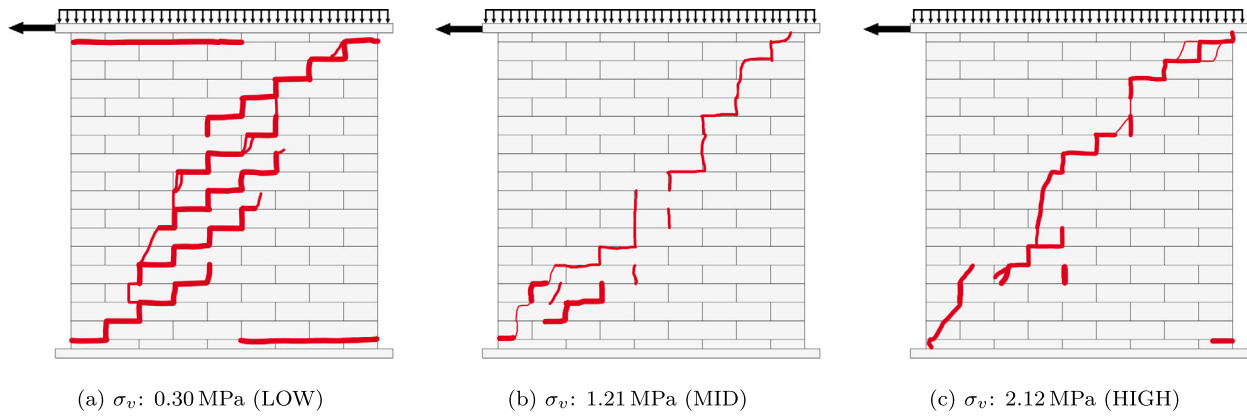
Damage pattern of the shear-compression masonry wall test [77].
